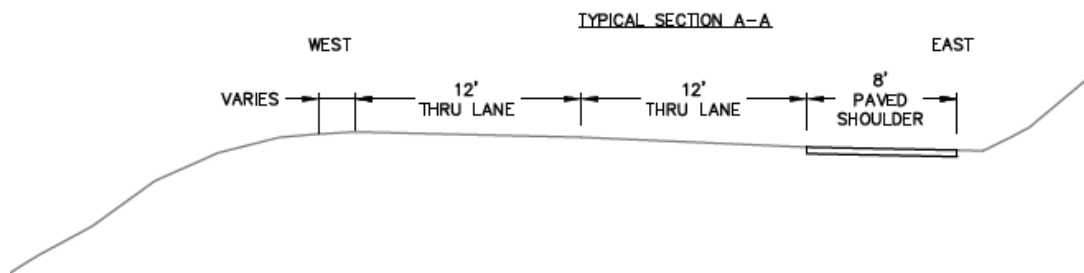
Typical Section A-A for CSAH 33 Concepts 1 & 2
